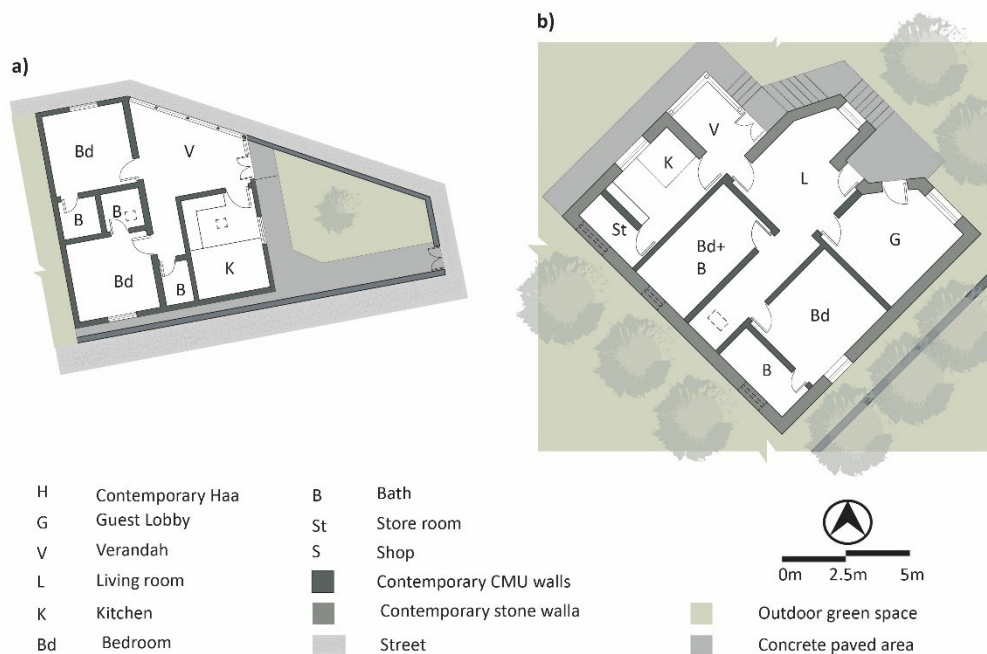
Plans of contemporary houses. a) A low-income house built with CMU Block Walls b) A middle-income house built with contemporary stone walls. Adapted from Imtiaz and Rempel (2024) [78]
